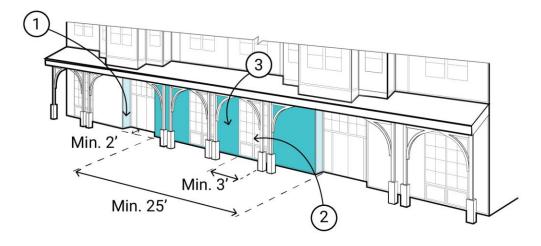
(B)(4)(b)(i): Façade requirements, certain streets — VMU District
